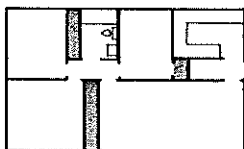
Floor plan of a one-story development house. 24'-0" x 40'-0".
